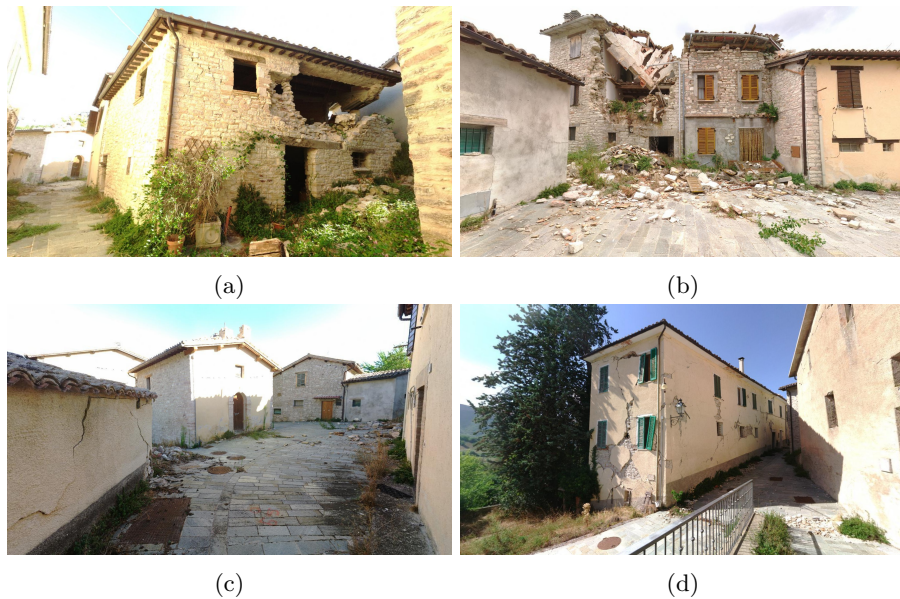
Damaged buildings in Gabbiano (Pieve Torina, Italy) on which is possible to observe different typologies of collapse. (a) Example of collapses stone Façade, (b) example of roof collapsed in stone buildings, (c) example of small urban area with cracks and (d) example of more recent building with cracks.
